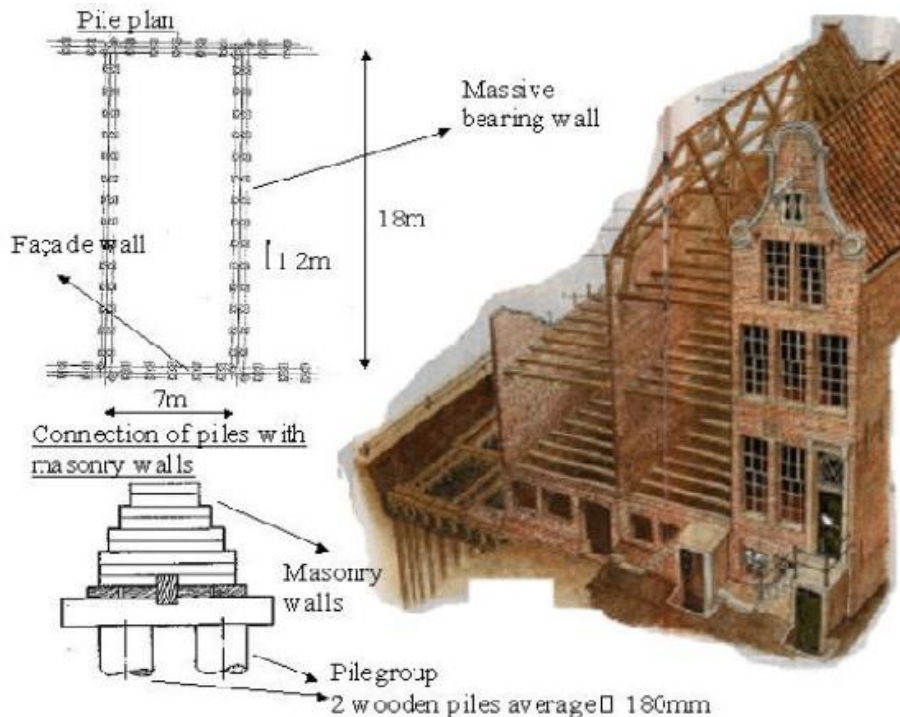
Typical Amsterdam Foundation (Zantkuijl, 1993)
